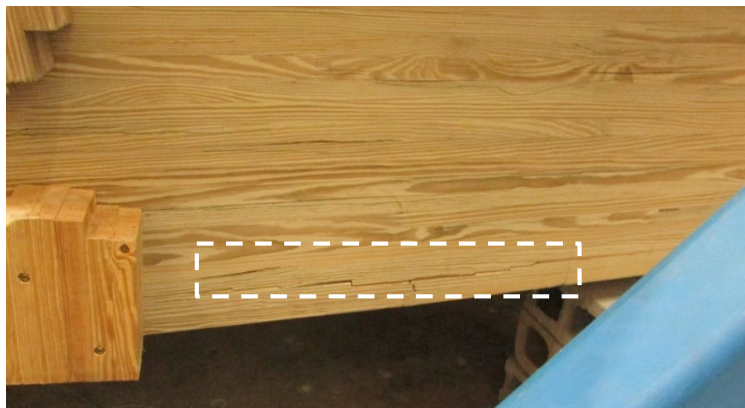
First Crack During Strength Testing in the West Girder
